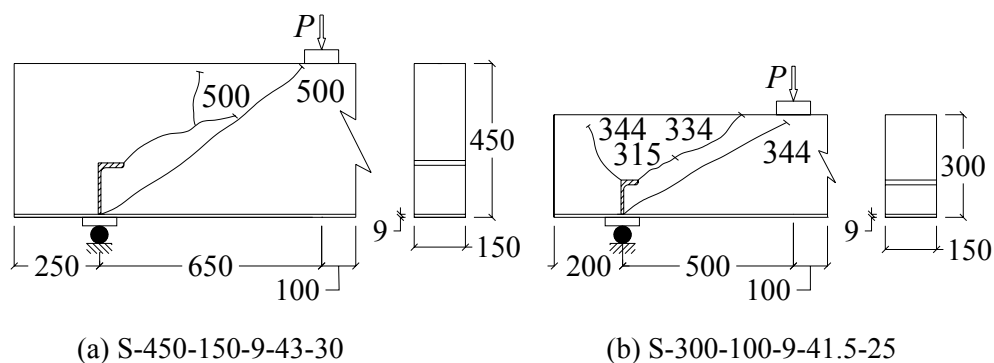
5 Crack patterns of specimens failed in split failure mode.
